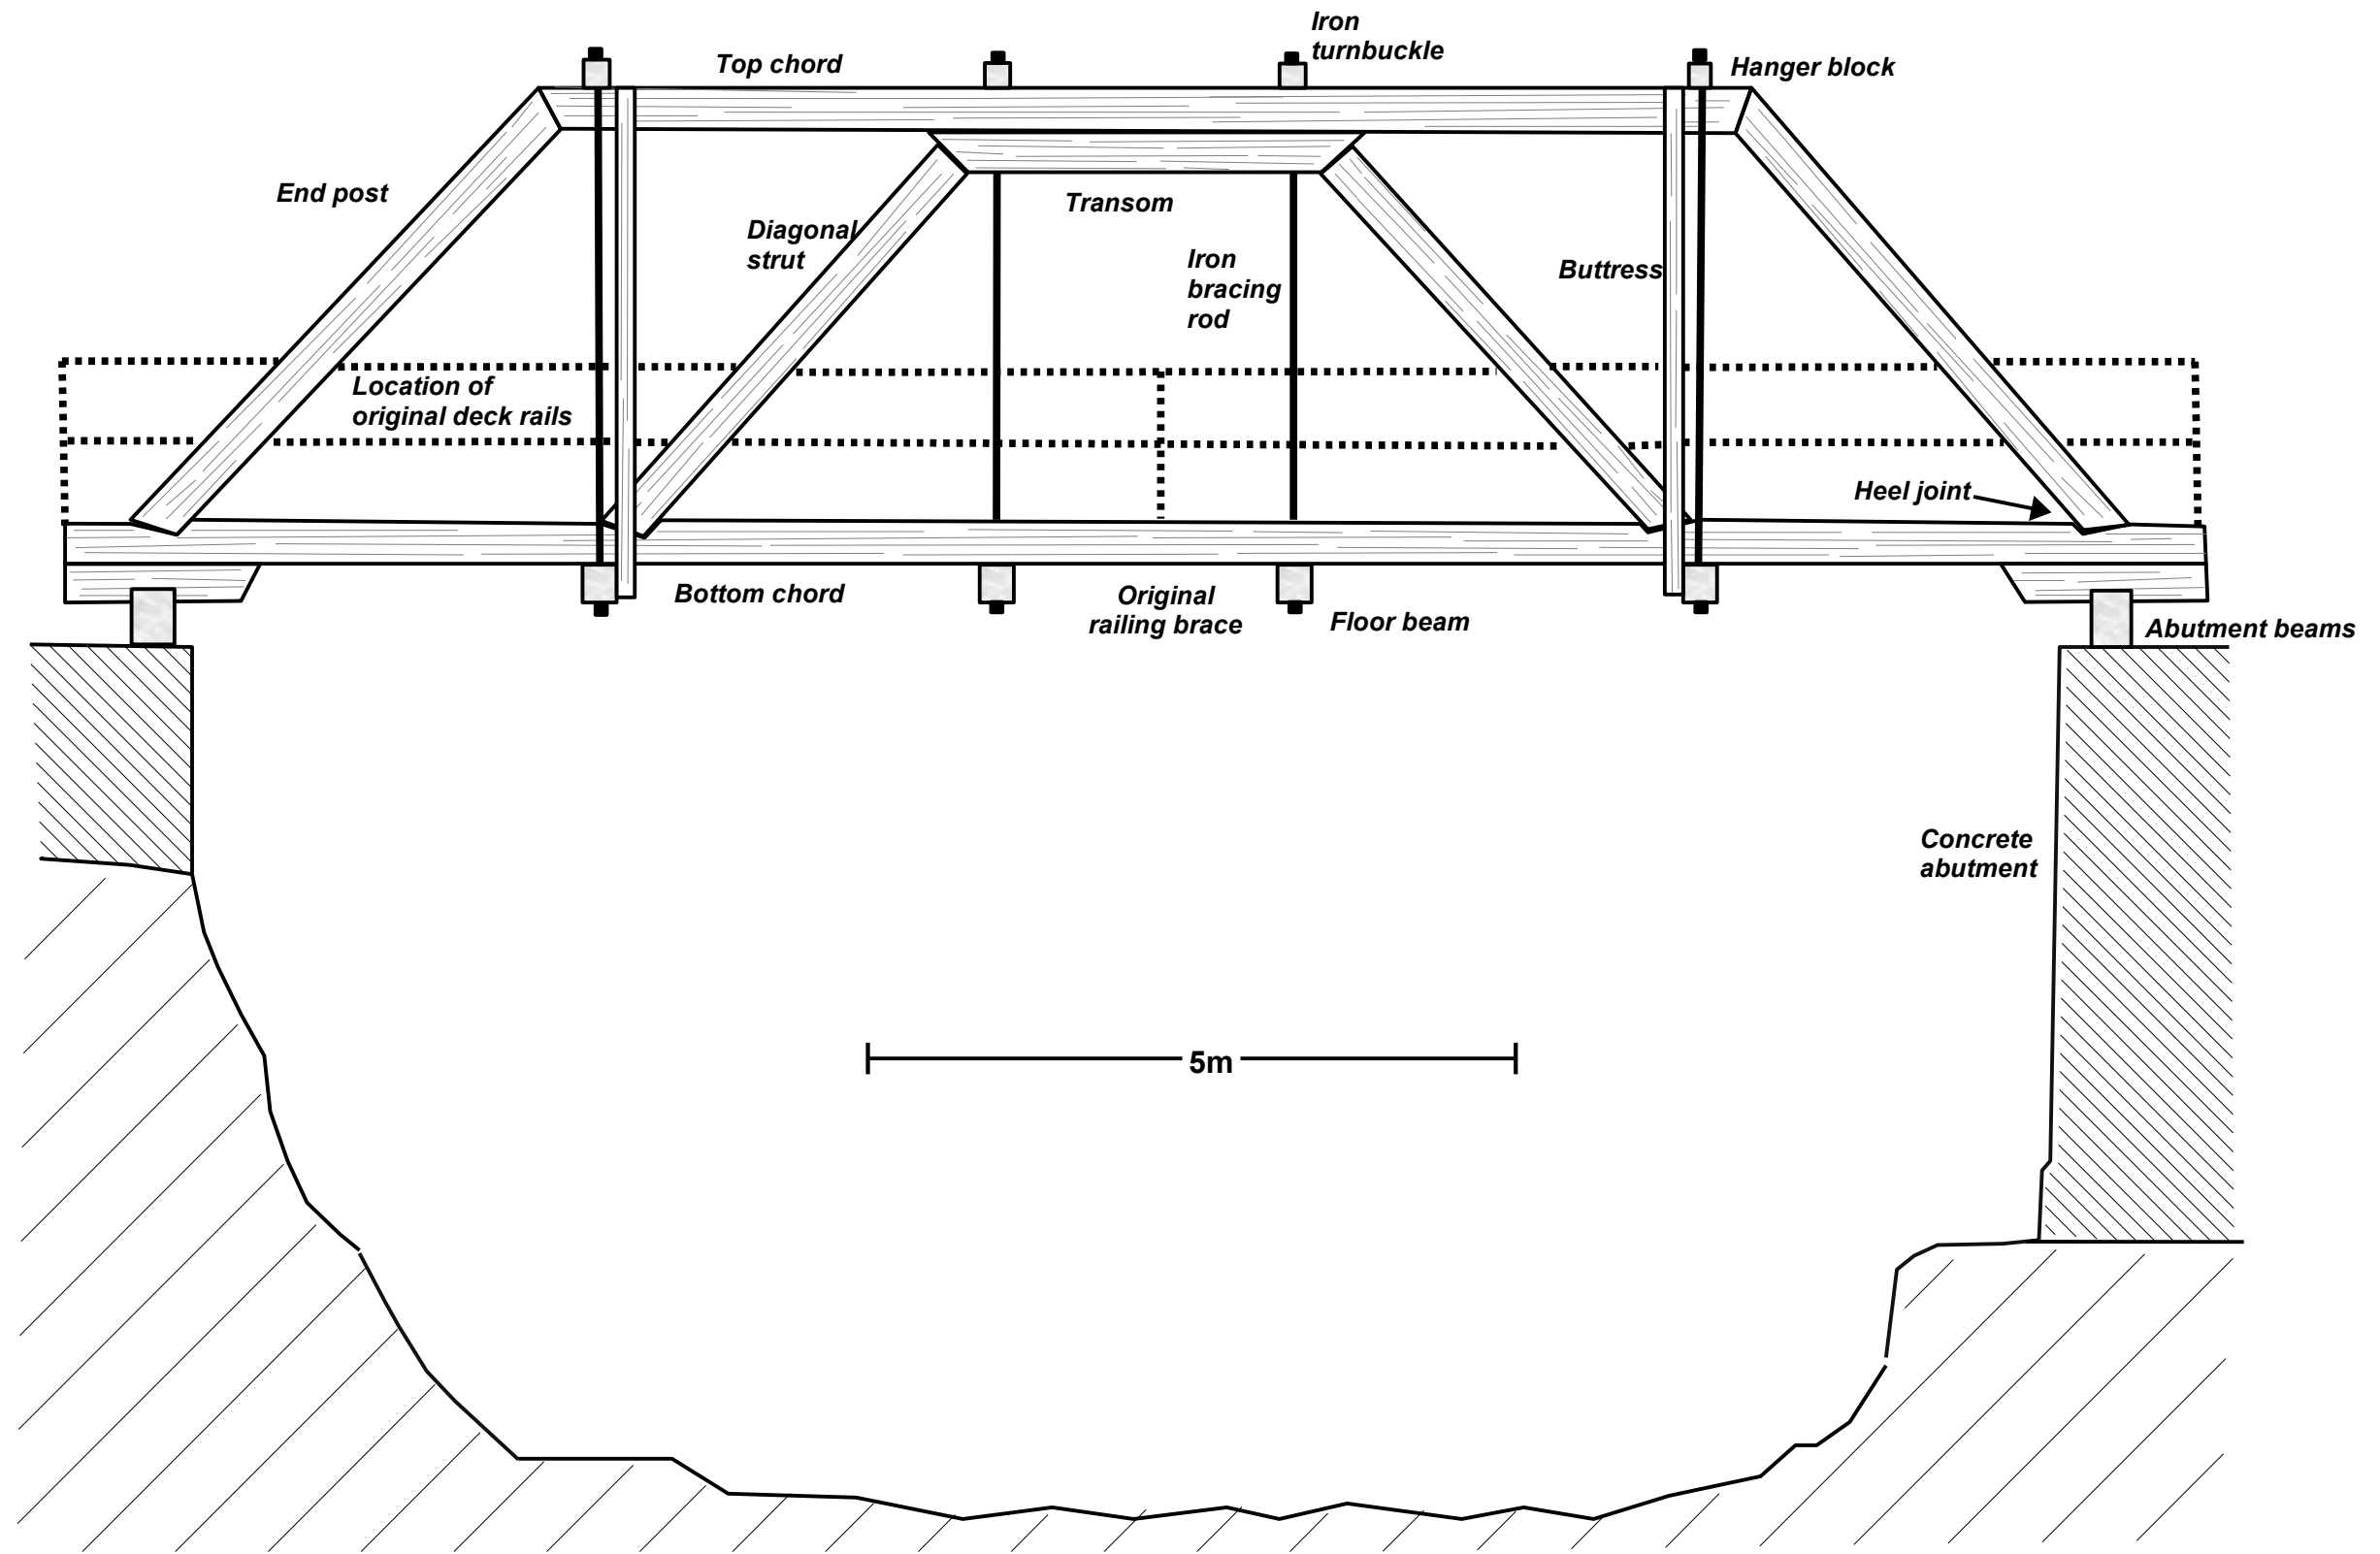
Beechwood Lane Bridge – Elevation of main truss structure west side facing east
